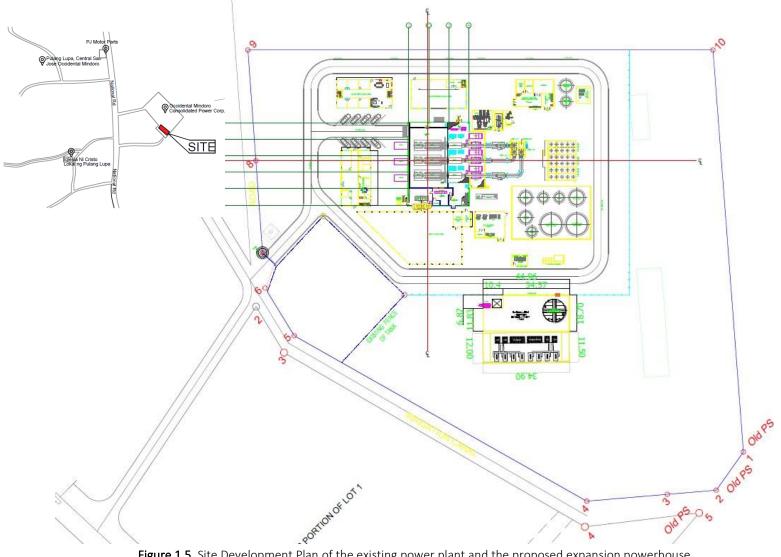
Site Development Plan of the existing power plant and the proposed expansion powerhouse
